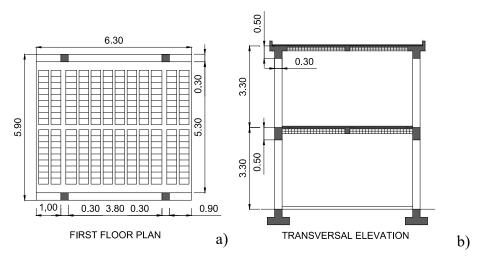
First floor plan view (a) and in-elevation transverse section (b) of the module n.5 of the ILVA-IDEM structure
